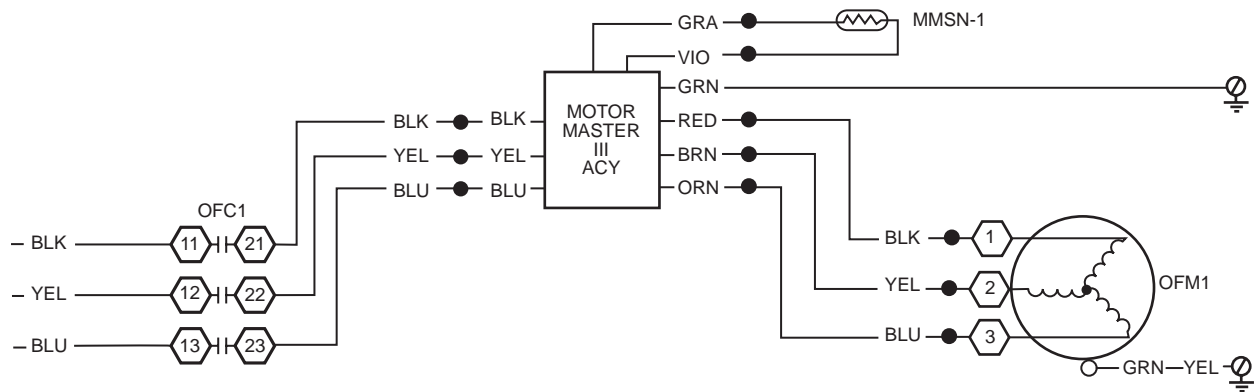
Motormaster® III Device Wiring, 48/50EJ,EK,EW,EY024-034 — All Units Except 575-v Units
